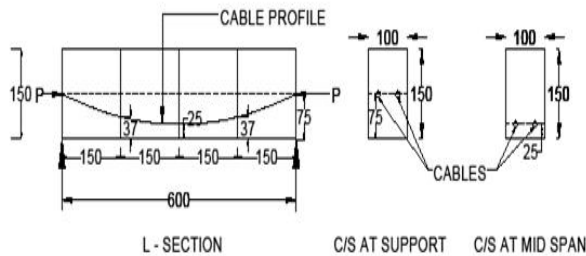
Cable profile and geometric details of Beam A2, B2, C2
